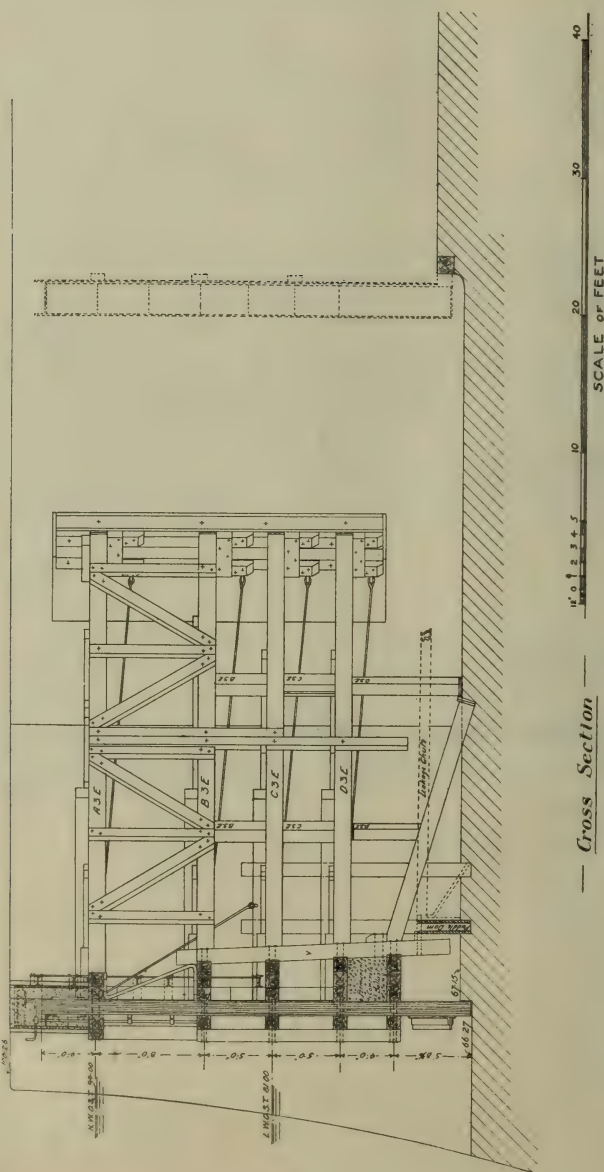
L. & S.W.R. SOUTHAMPTON DOCKS: DRY DOCK No. 3: TEMPORARY DAM AT ENTRANCE AS CONSTRUCTED.
